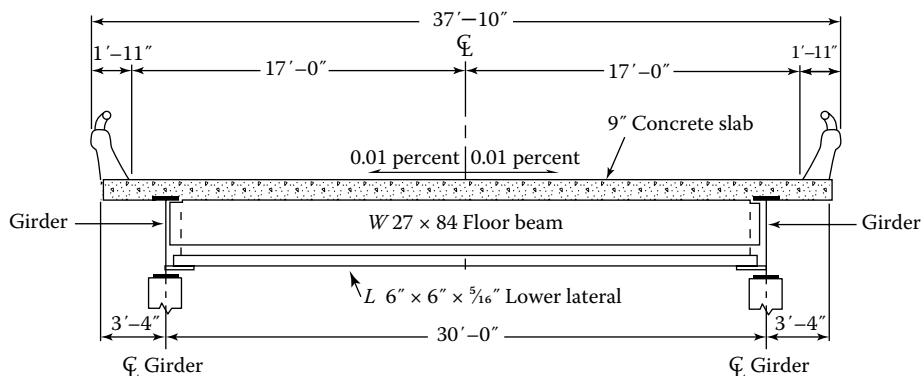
Example of a concrete slab spanning *longitudinally* over the transverse floor beams that are framed into two longitudinally spanning plate girders. The primary reinforcement in the slab is oriented *parallel* to traffic. (The dimensions shown are project specific, shown here for illustrative purposes only.)
